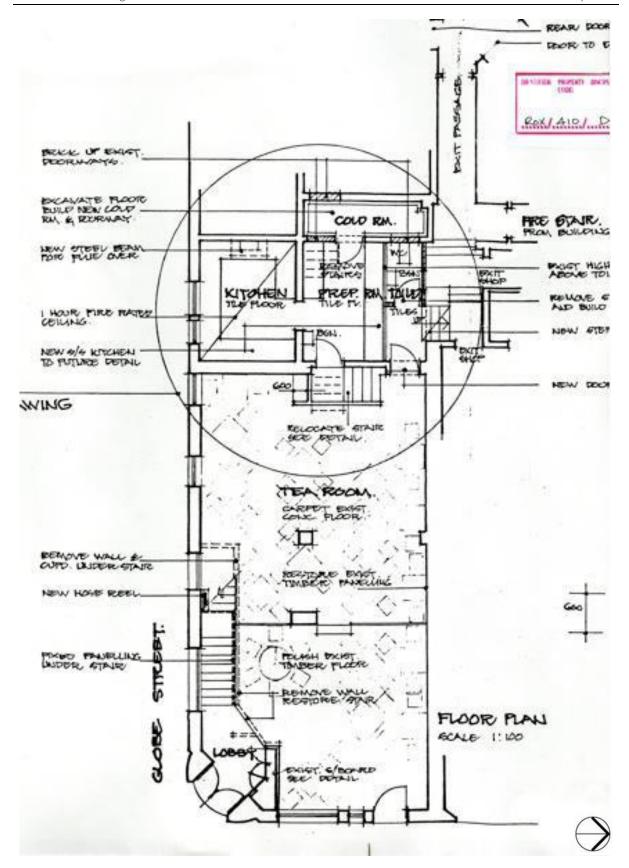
Alterations to the front section of the ground floor of 143–143a George Street in 1984. Source: PMNSW, Drawing ROX-410-DA-0014-DR.
